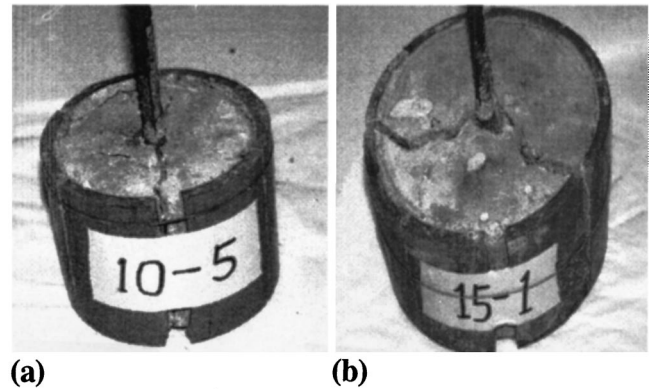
Typical failure modes of tested specimens: (a) Specimen 10-5; (b) Specimen 15-1
